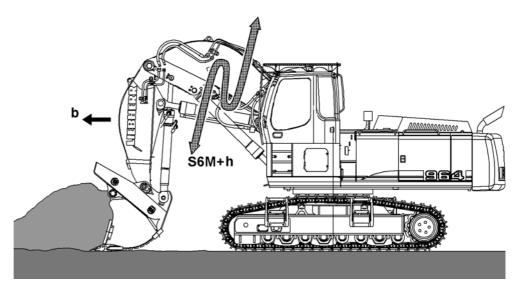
Float position of the boom cylinders with a shovel attachment
